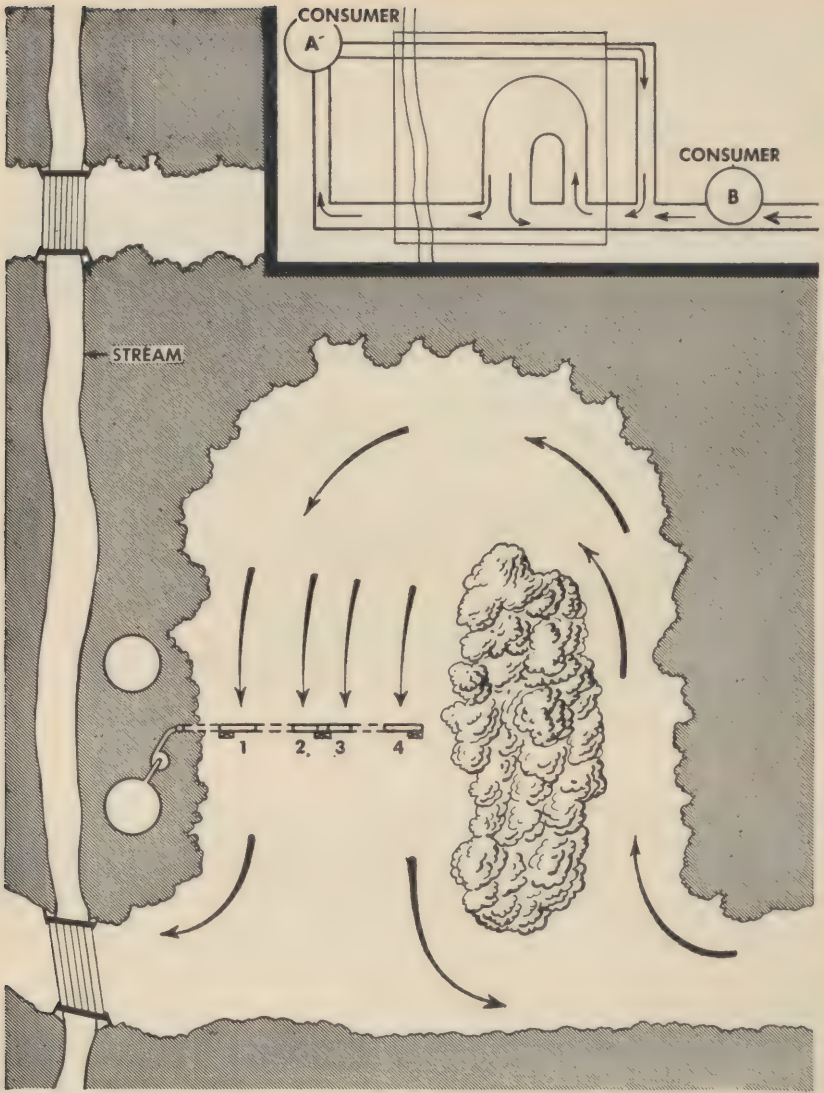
Plan of turn-around at centrally located water point. Note circular traffic plan shown in insert.
